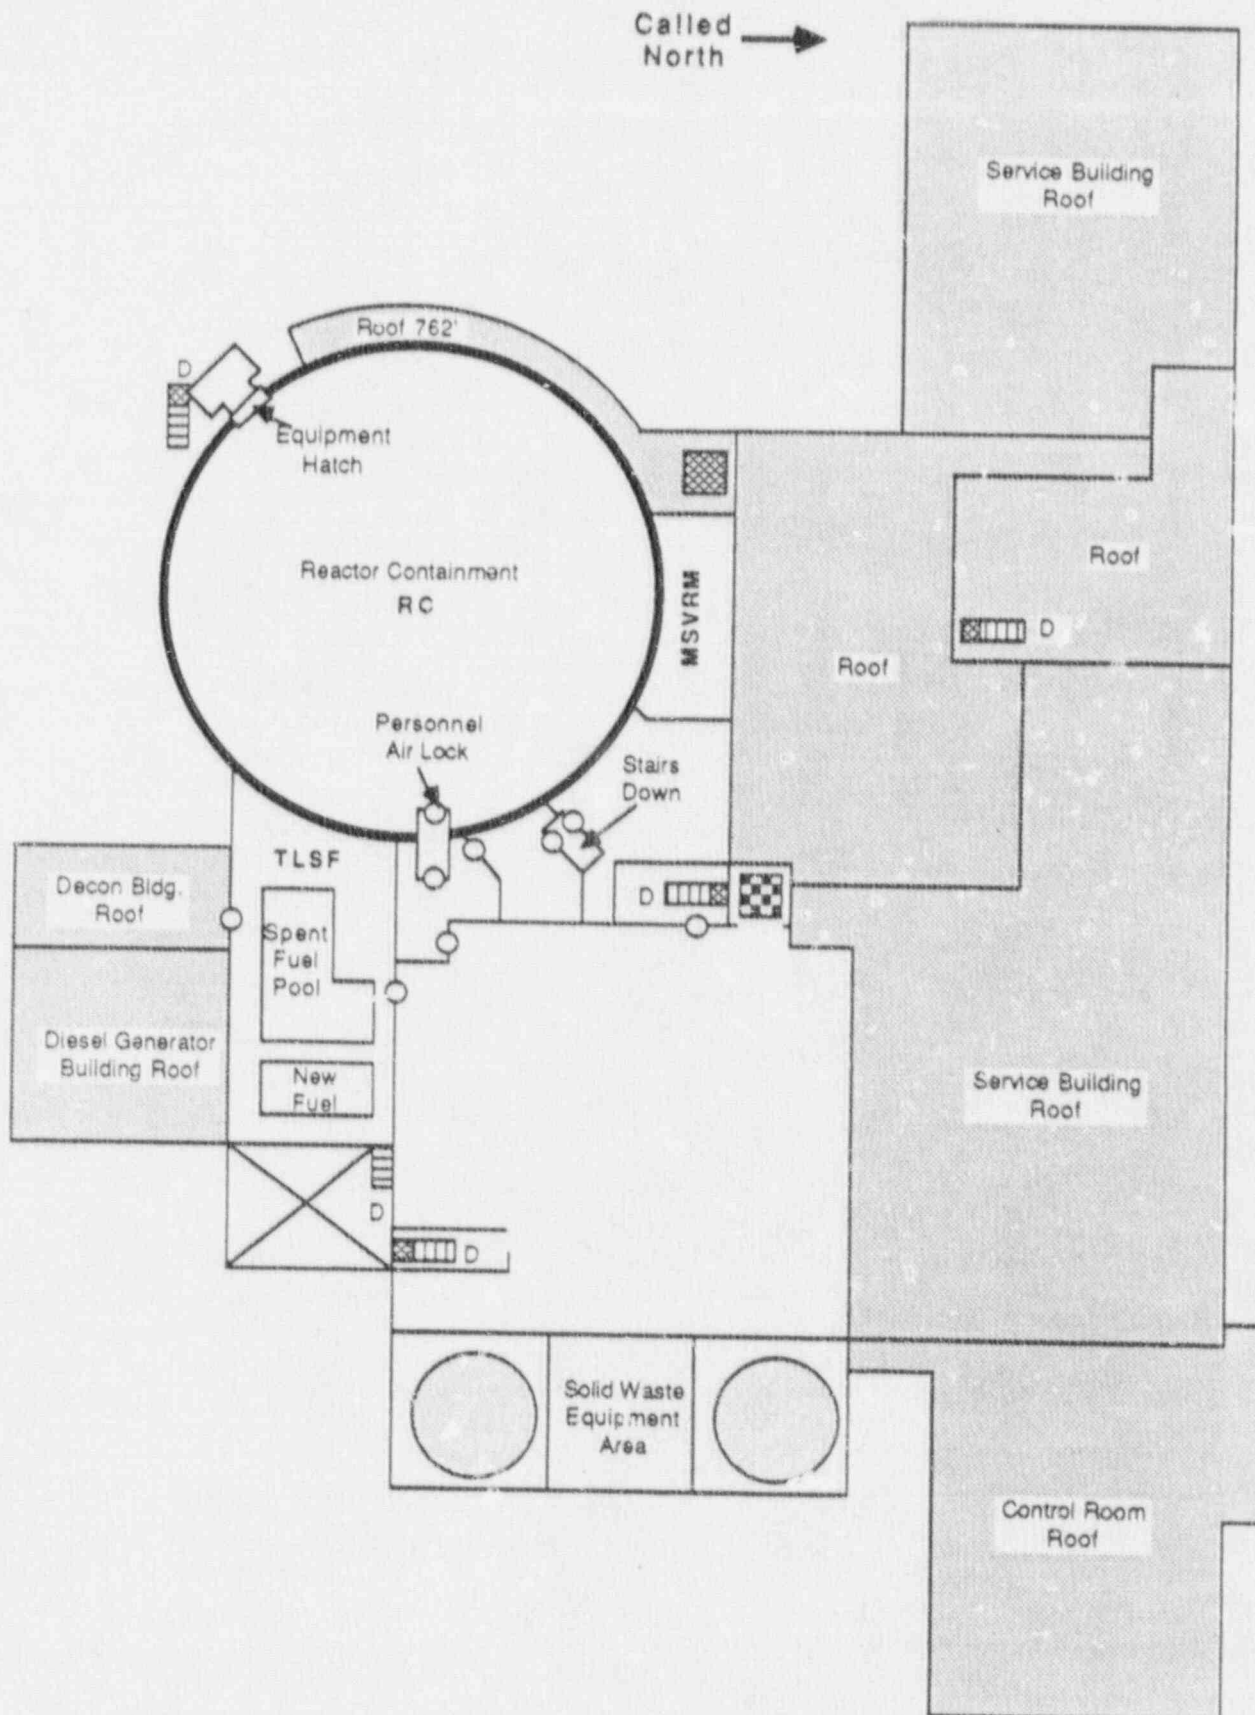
Beaver Valley Unit 1 Station Arrangement, Elevation 767'-10"
